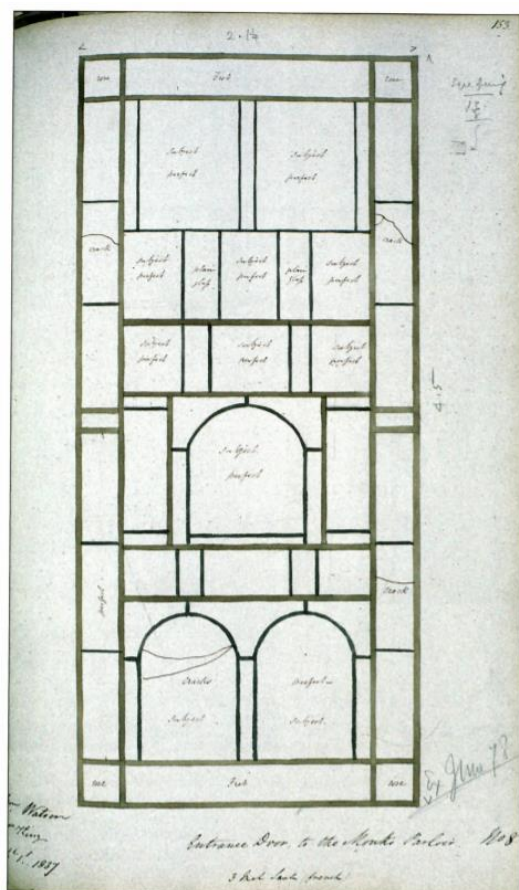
George Bailey, Plan of window from entrance door to the Monk's Parlour, John Soane's Museum (London), c. 1837.
